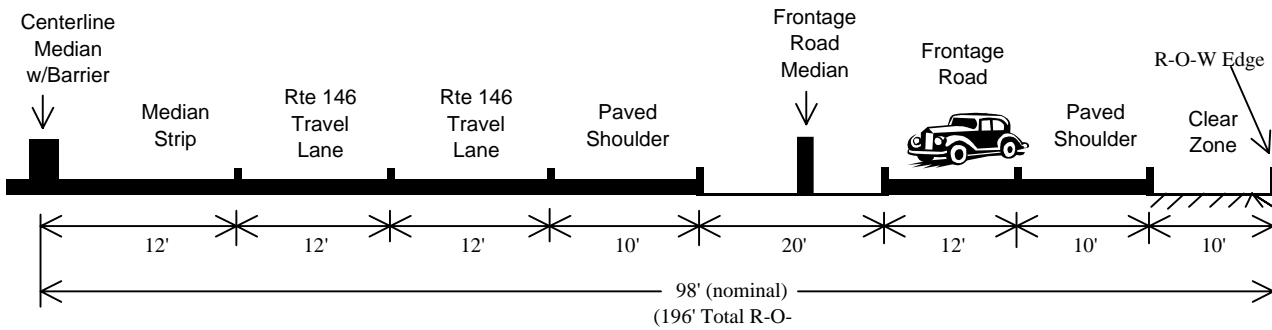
Route 146 Existing & Suggested Cross Section (not to scale)
